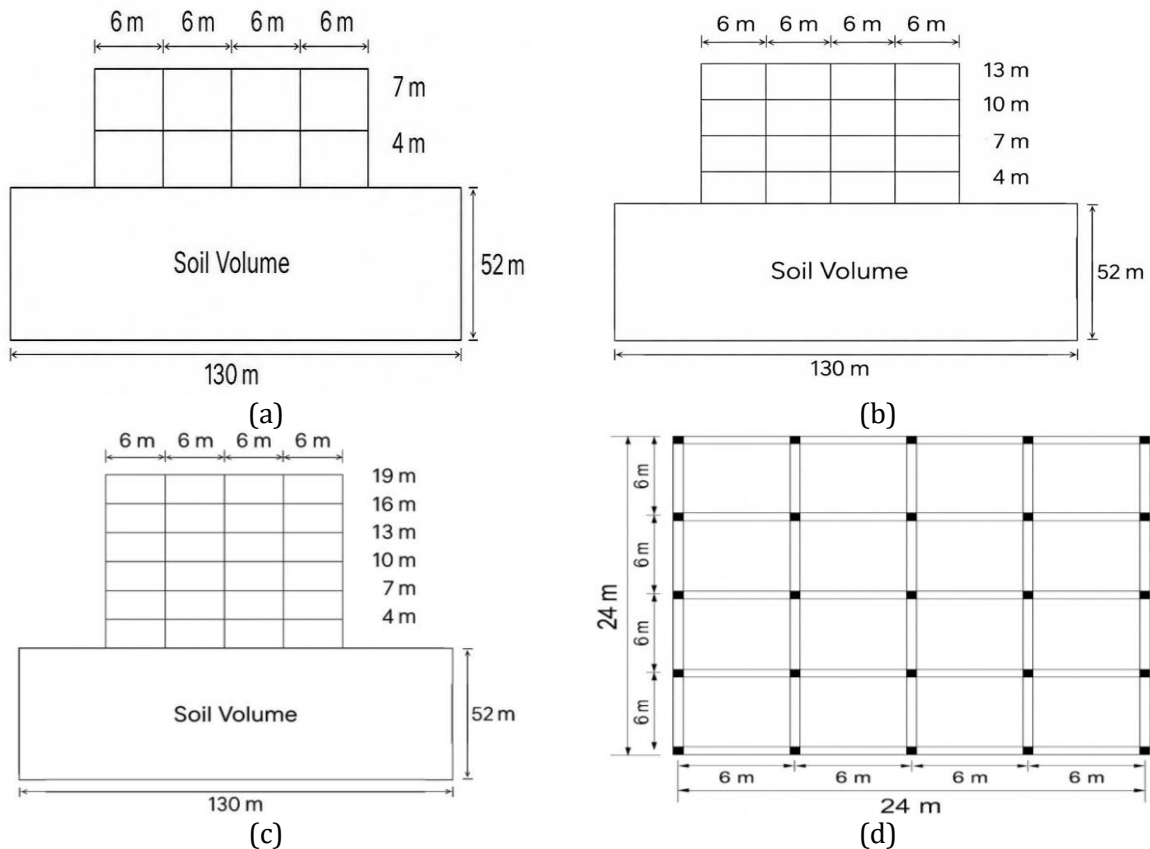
(a) elevation of 2-storey building (b) elevation of 4-storey building (c) elevation of 6-storey building (d) plan showing slab beam
